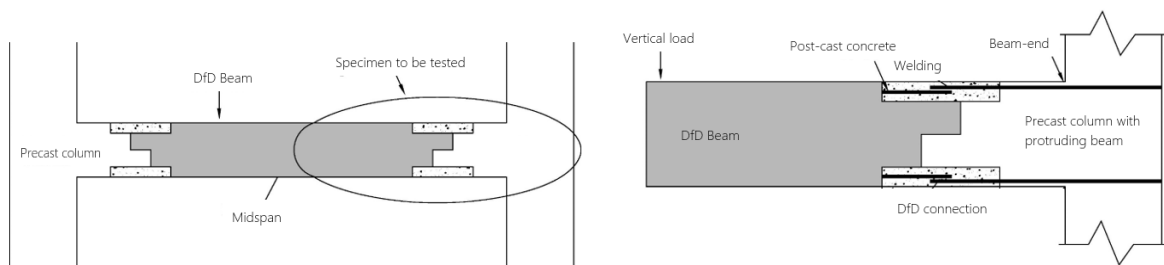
Prototype of DfD concrete structure and details of proposed DfD beam/beam connection [76]
